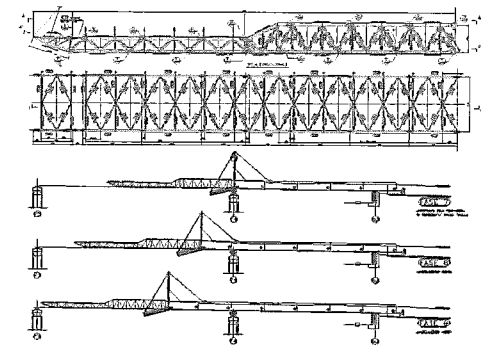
Lattice launch girder using S690. Lateral prospect and plan – Some launching phases
